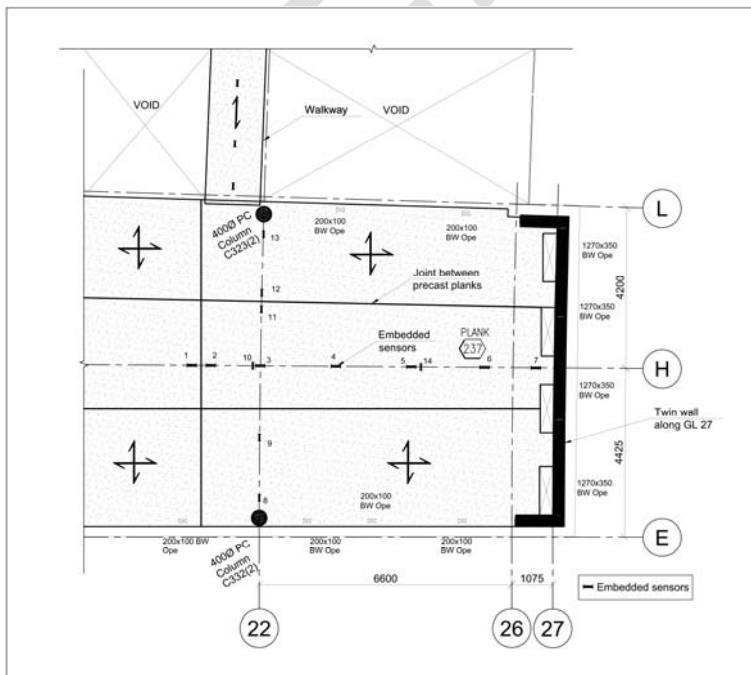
Part of second floor slab of HBB with insitu instrumentation
